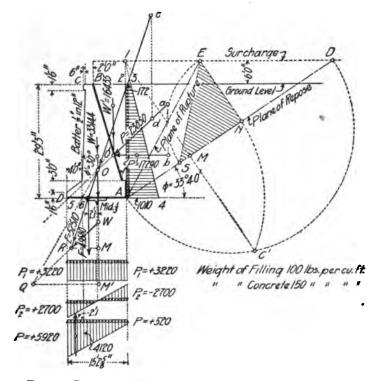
RETAINING WALL, WEST ALAMEDA AVENUE SUBWAY.
